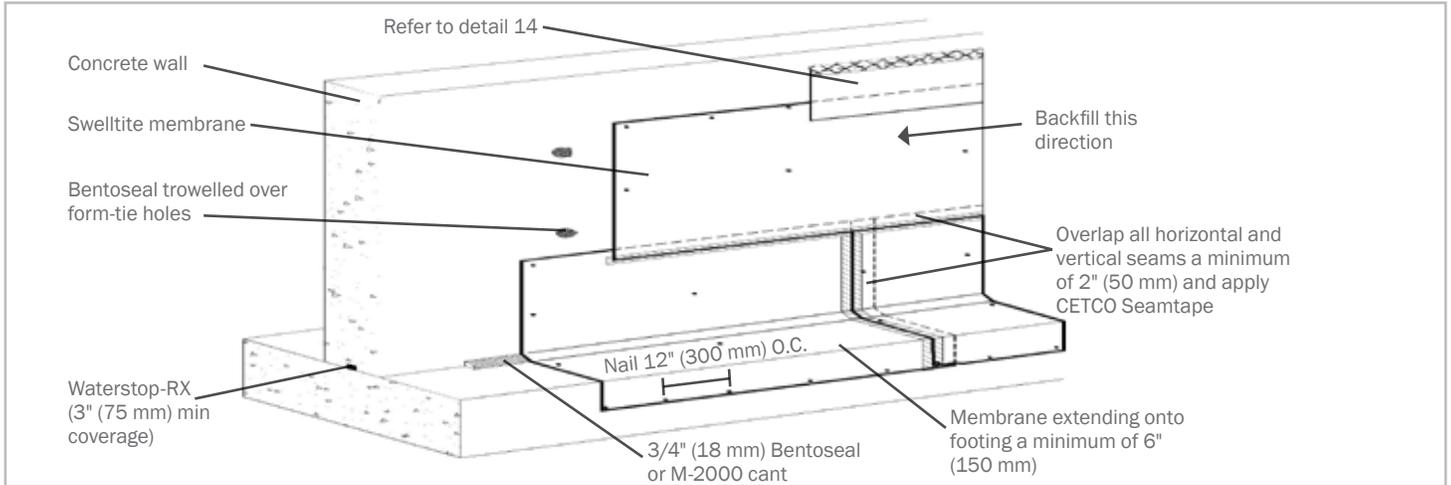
Foundation wall detail (non-hydrostatic condition)
